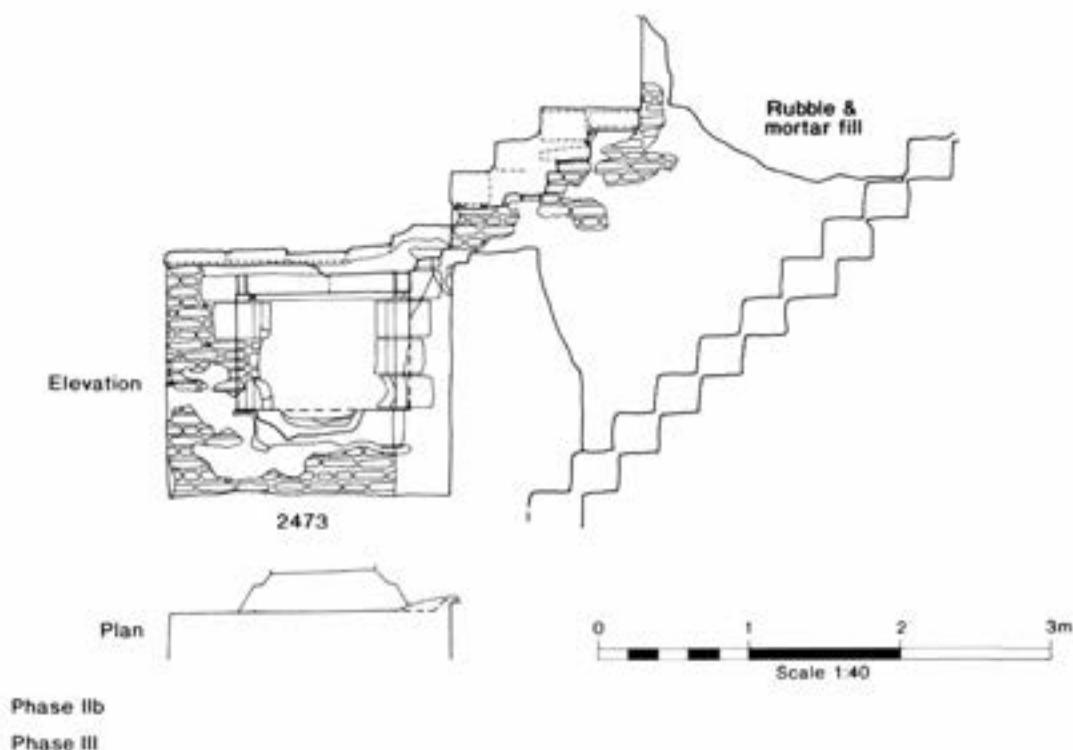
Entrance Bastion internal elevation: detail of stair
